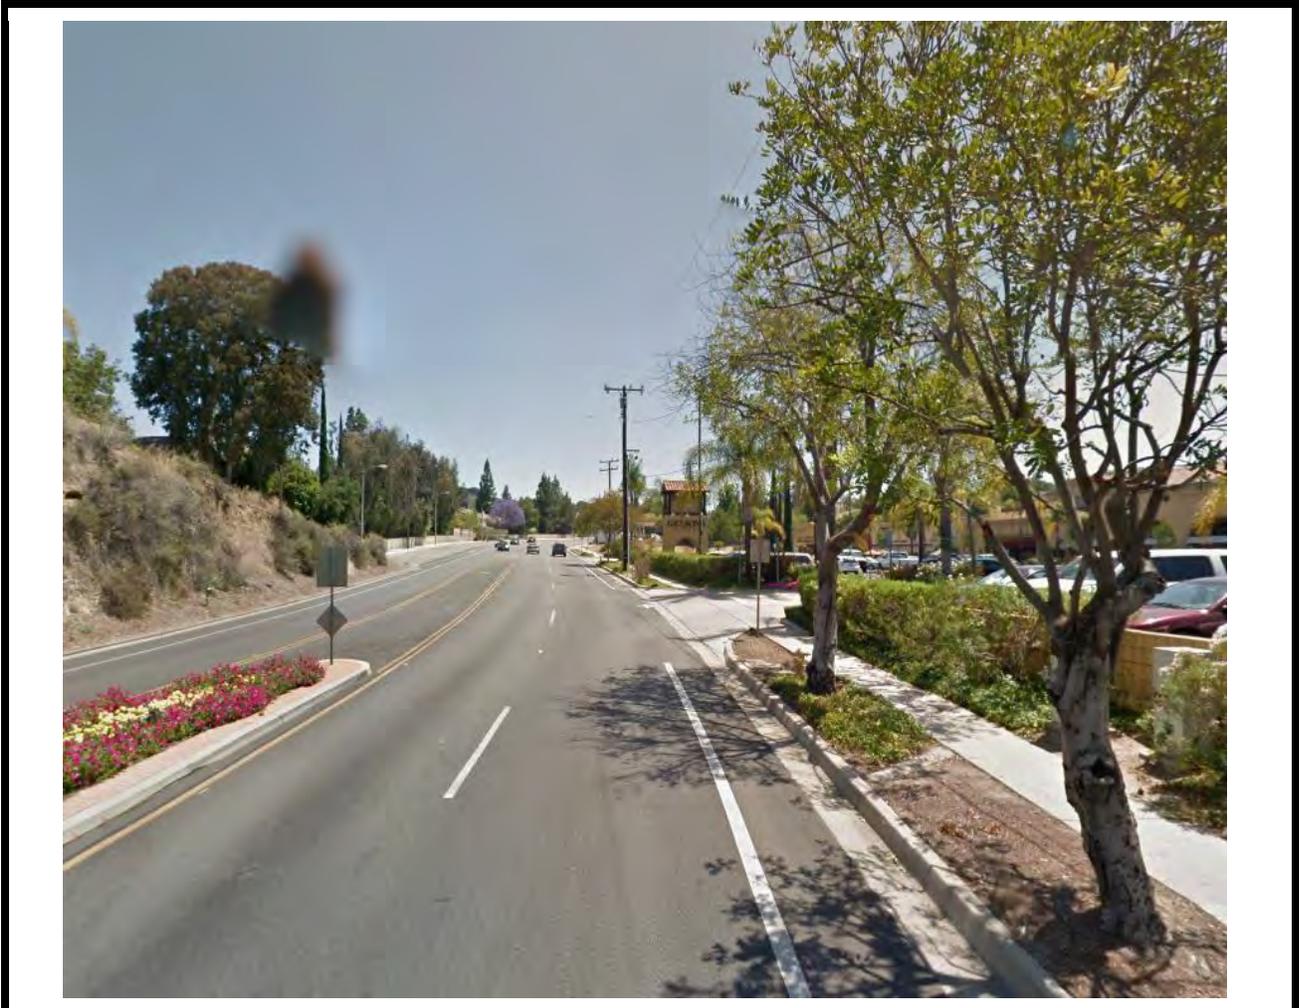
Current conditions: Commercial Retail Center (Gelson's Shopping Center) at Mulholland Highway at Mulholland Drive Looking South.
